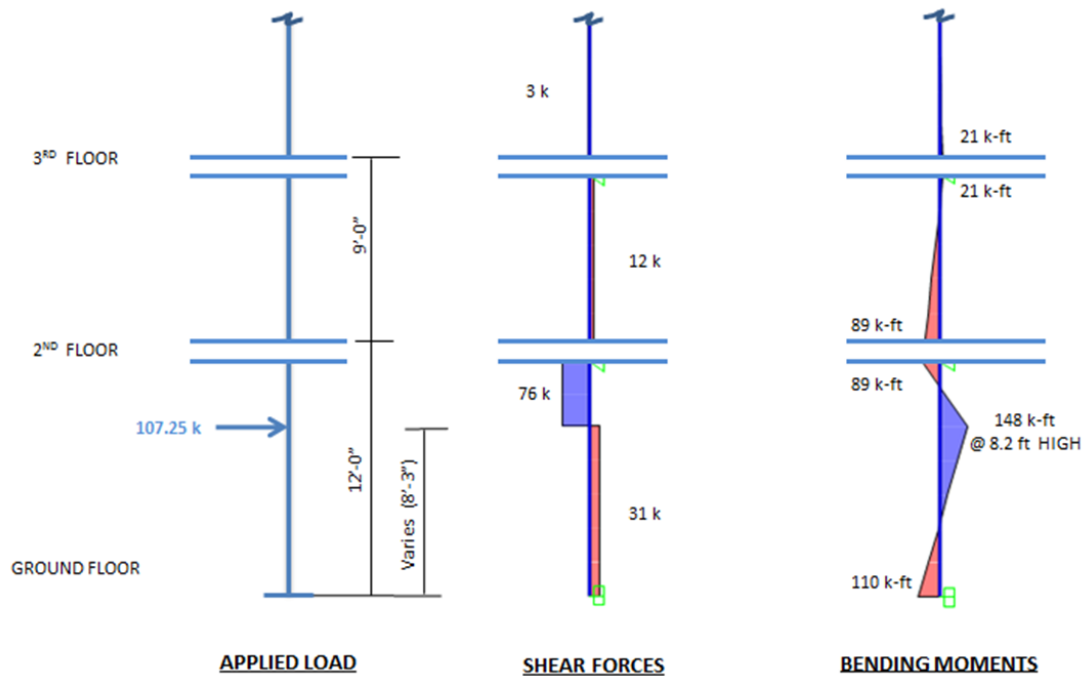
Impact load applied at " $d + h_c$ " away from the top of column on the ground floor of the Seaside residential building
